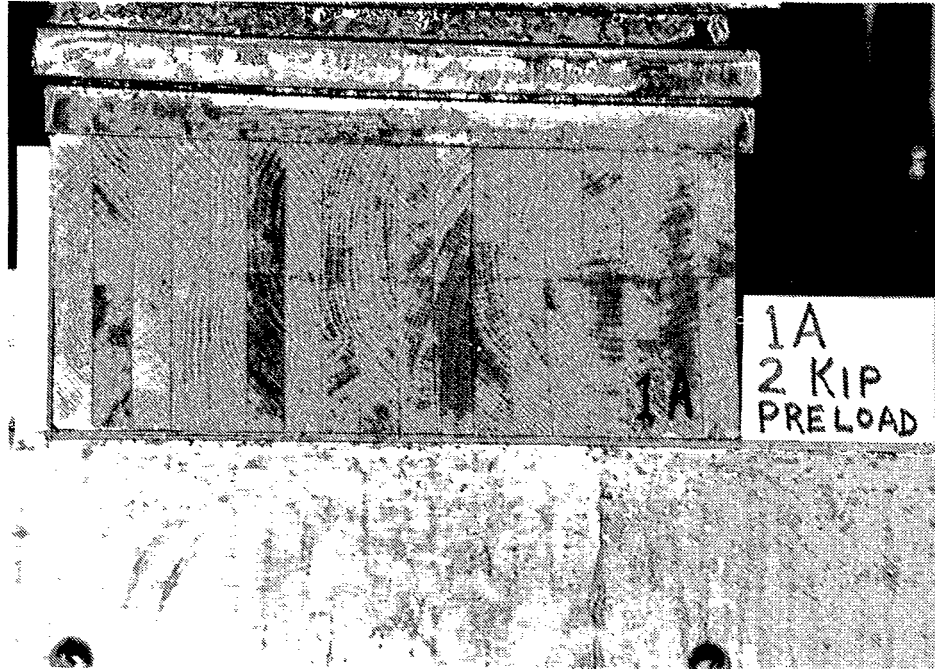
Laminated timber ready for testing in 600,000-lb. Universal testing machine.
